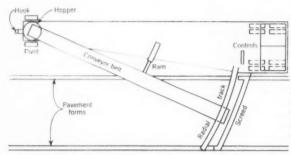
Job-developed concrete spreader, named Sputnik, has a conveyor belt pivoted under the feed hopper. The conveyor is moved sideways on a radial track by a hydraulic ram to spread concrete across the 12-ft lane.
